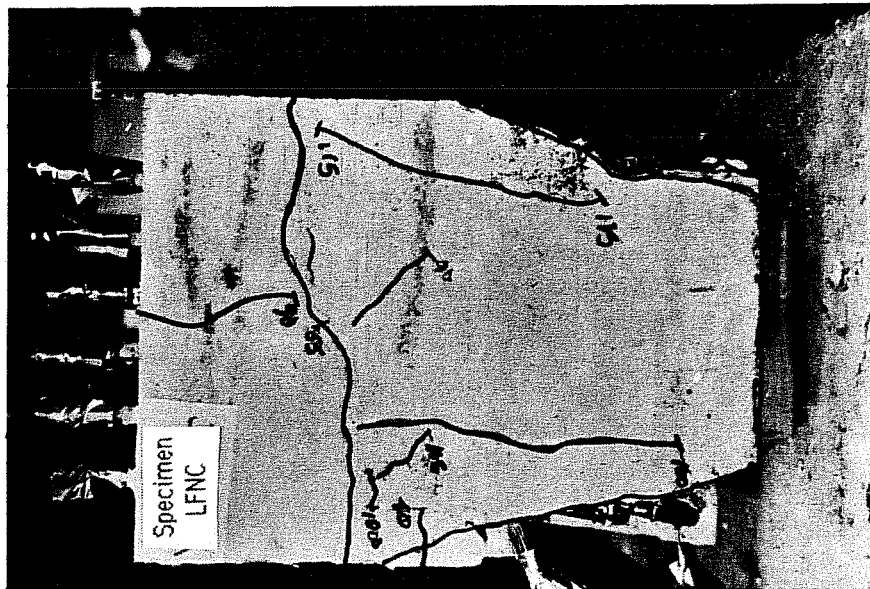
Specimen LFNC-Cover Splitting Failure (North and End Faces)
